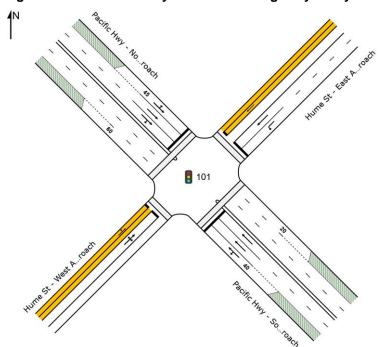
Intersection layout of Pacific Highway/ Hume Street intersection
